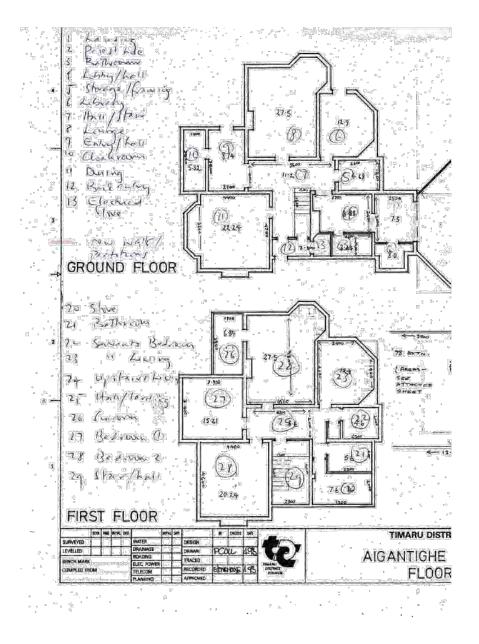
Current floor plan, Aigantighe Art Gallery Archive.
